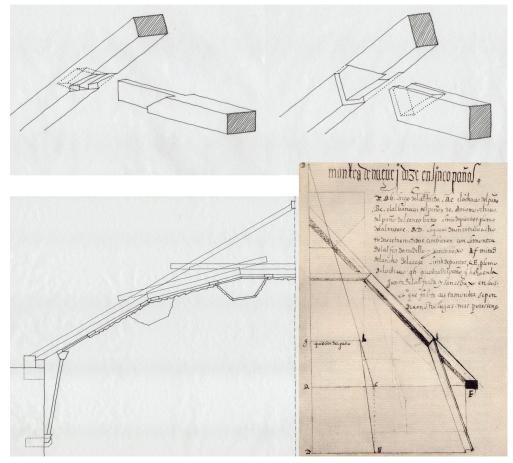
Mortise and tenon joint detail in Castroverde de Campos, with through tenons. Five-panel ceiling structure section in Castroverde, with one single support level at the top of the wall, and additional frieze borne by corbels at a lower level. Right: T-bridle or *garganta y quijera* joint detail. Five-panel ceiling section in the López de Arenas manuscript, showing two support levels.
